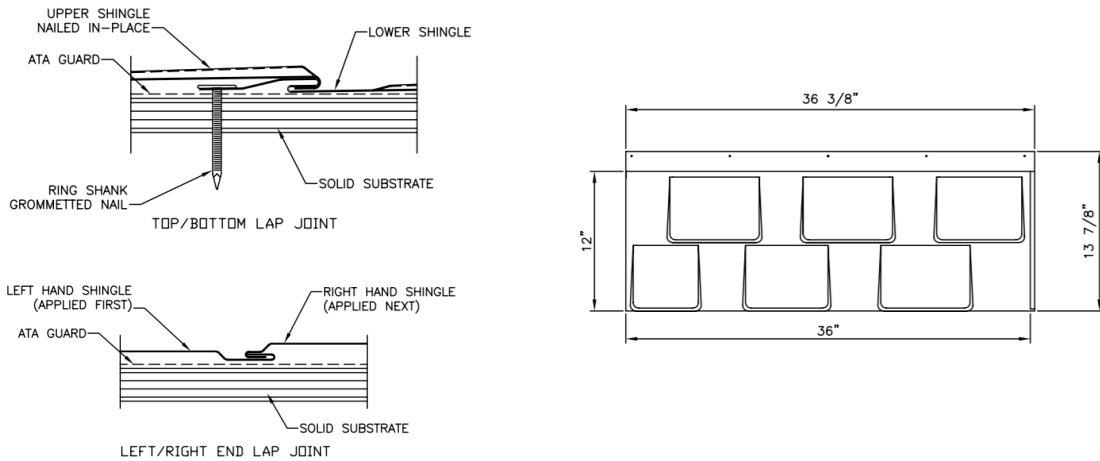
Detailed technical drawing of metal shingles, showing dimensions, lap joints, and connections. Dimensions are in inches. (Drawing provided by ATAS International)
